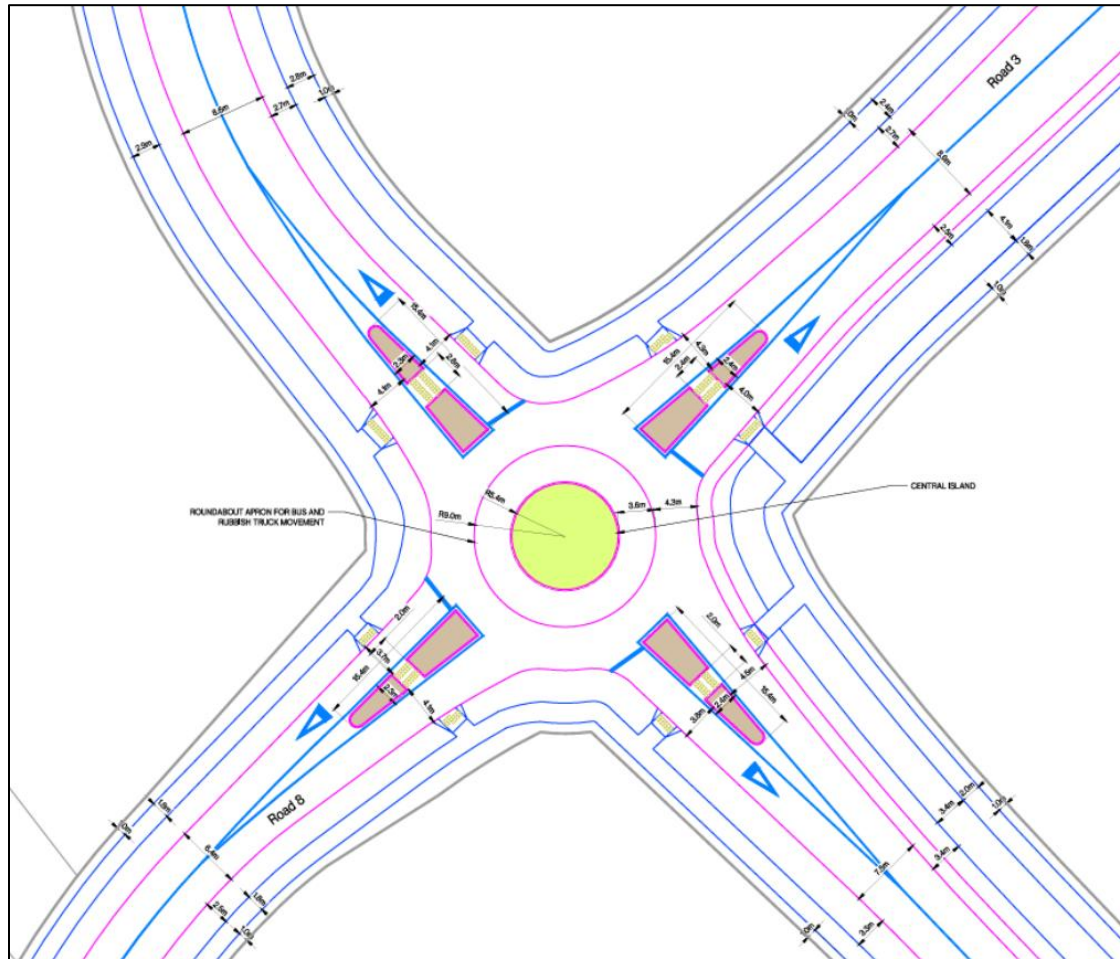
below shows the Road 1 / Road 3 / Road 8 roundabout intersection. As with the Road 1 / Road 5 intersection, each leg of the intersection provides one approach lane and one departure lane. Median island crossings with a 2.3m/2.4m refuge space are provided on all four legs of the intersection. The proposed roundabout will be partially mountable to allow for tracking of the AT 12.6m Truck or 12.6m Urban Bus design vehicles.
